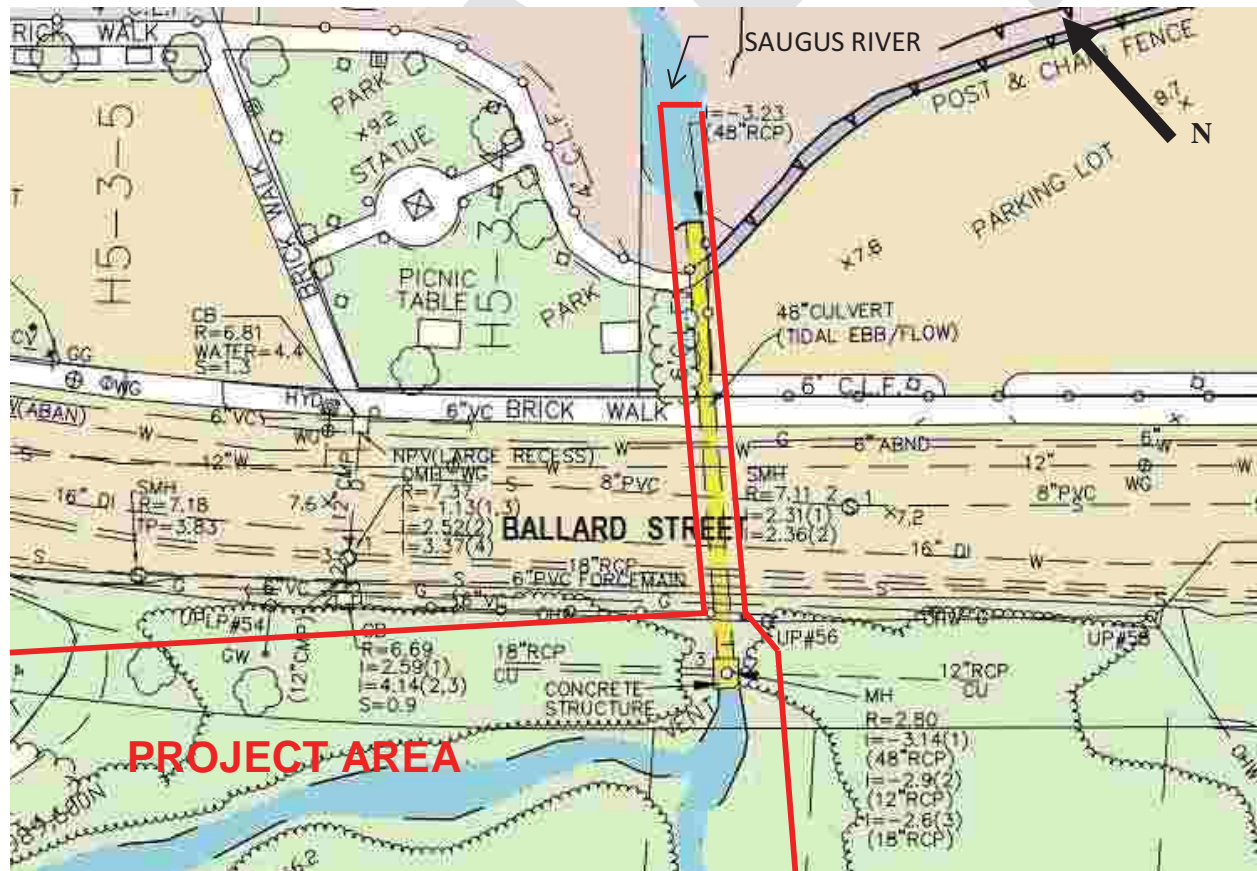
Ballard Street Culvert (“BA-1”) – Survey Plan
